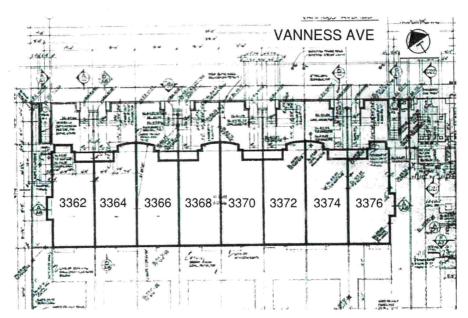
Site Plan Showing Townhouse Unit Numbers
